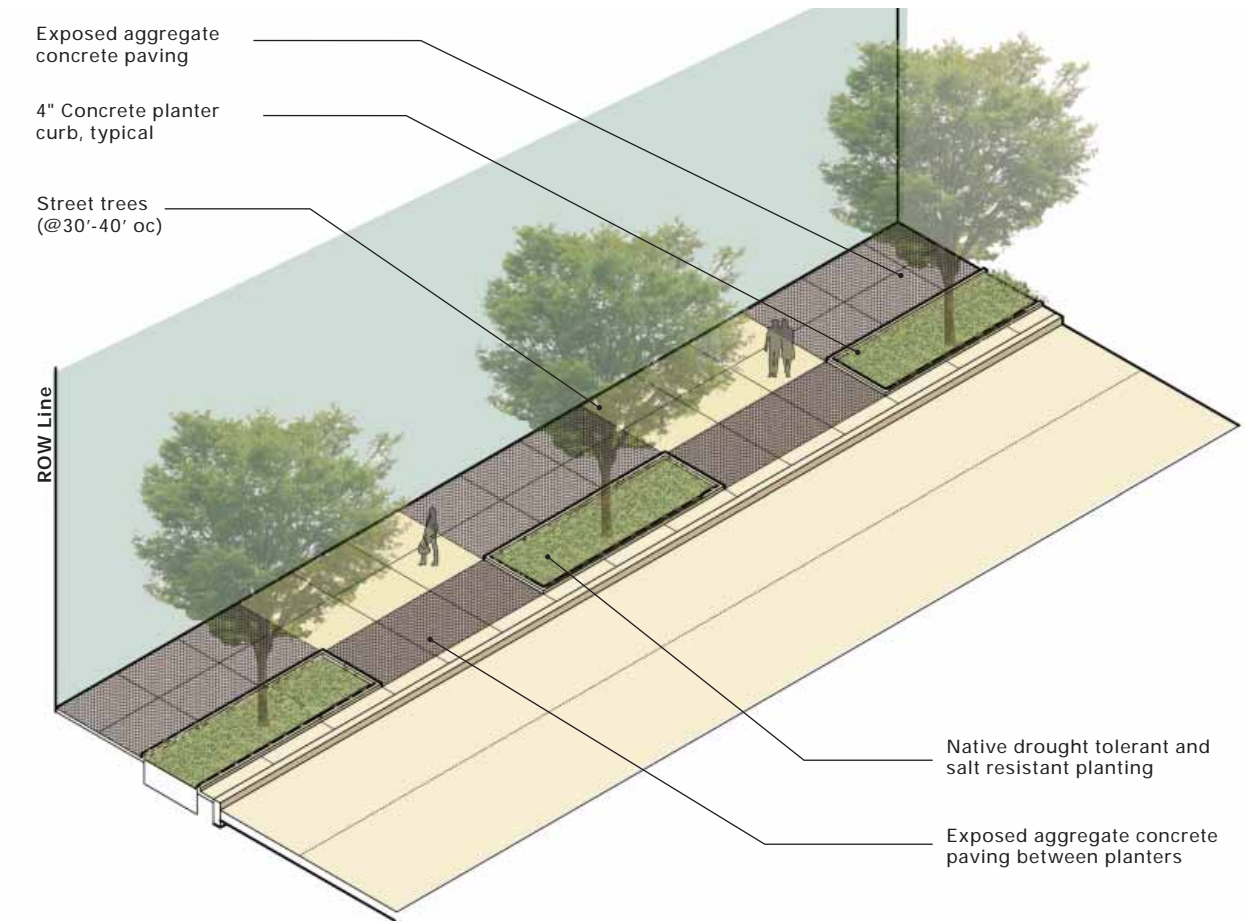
Axonometric drawing showing street paving configurations. Exposed aggregate paving aligns with the tree planters and extends to the ROW line, alternating with broom finish concrete between planters along the public sidewalk. Exposed aggregate paving is used in the band between planters, and a broom finish concrete accent strip is adjacent to the street curb.
